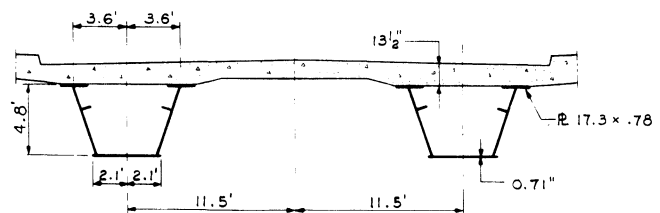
Approach spans for Frederikstad Bridge over the Glomma, Norway. Span 103 ft. Two steel boxes with cast-in-place composite concrete slab deck
